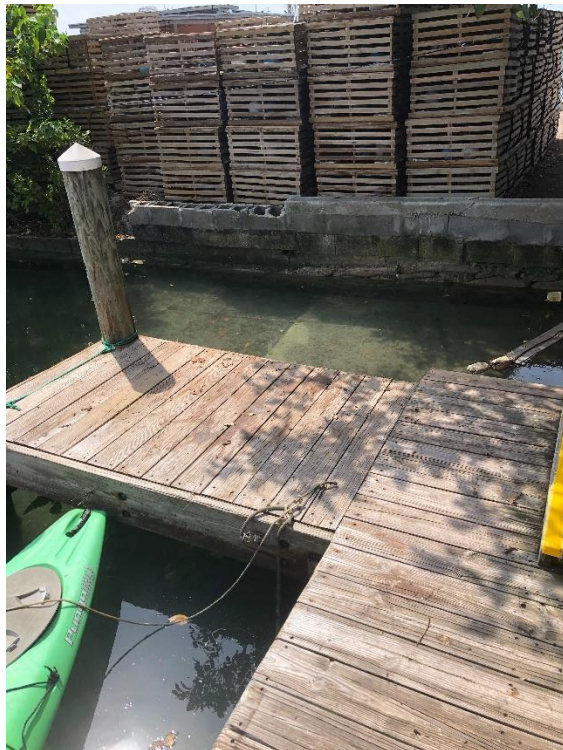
Unauthorized floating vessel platform is not longer present outside of the leased area on the southern end of the property. Photo can be compared to Photo 5.
